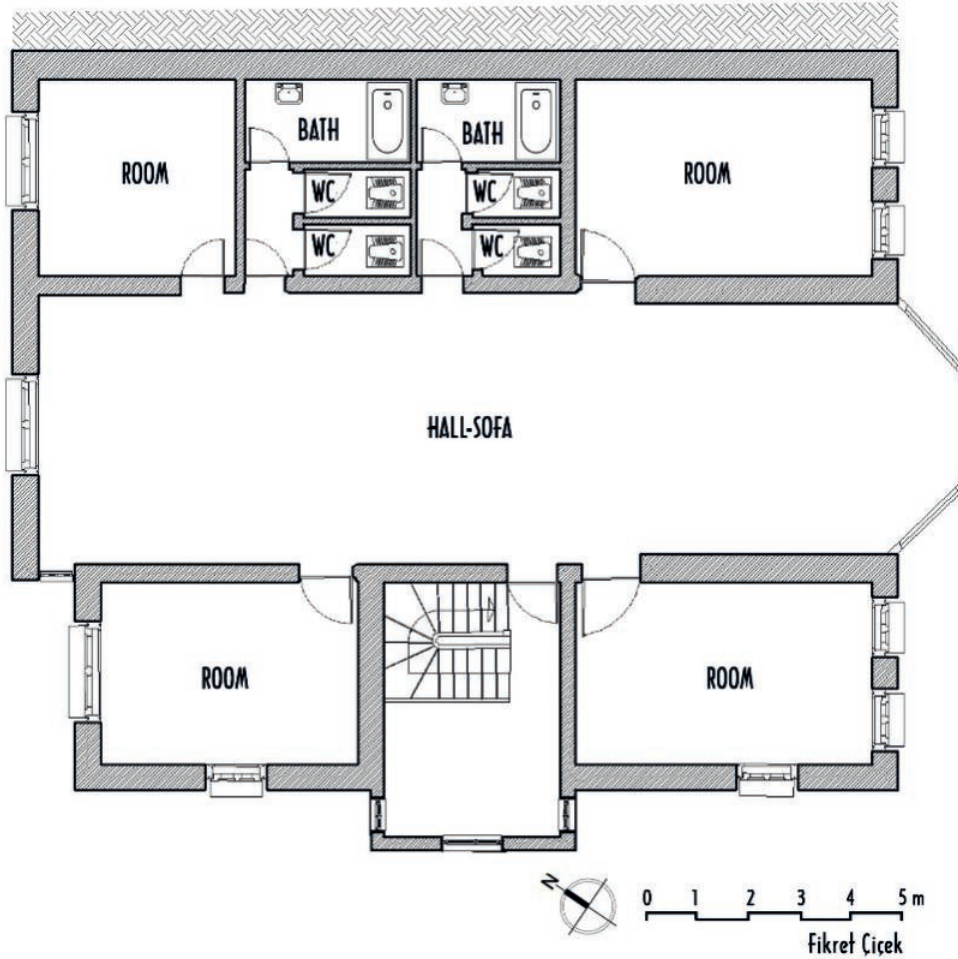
First Floor Plan of Arapoğlu Kosti House (Fikret Çiçek Archive)
